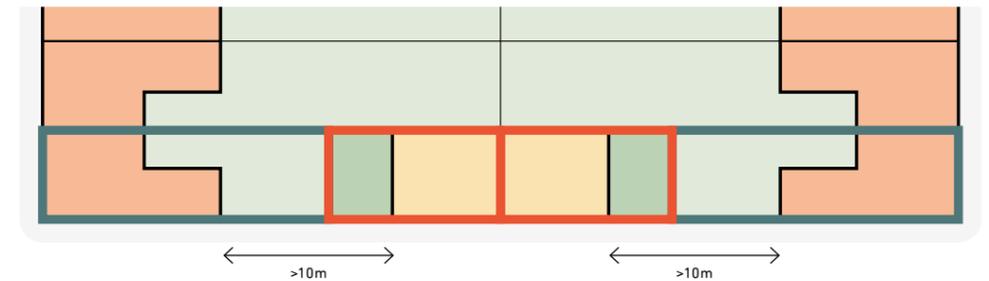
Where two existing properties have back-to-back gardens, there exists the potential for two new dwellings to be provided.
